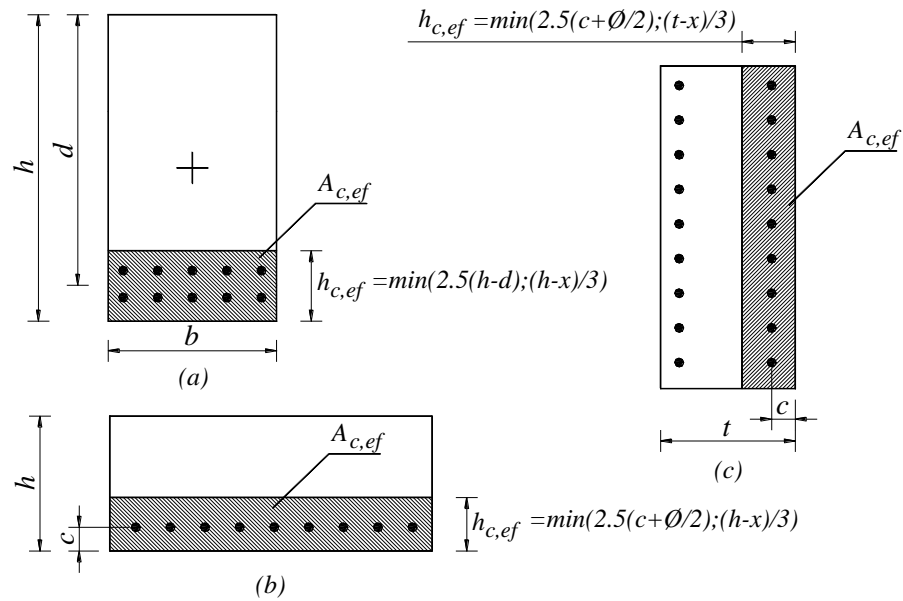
Determination of effective area of concrete in tension, $A_{c,ef}$, for: a) beams; b) slabs; c) walls (extracted from [30]).
